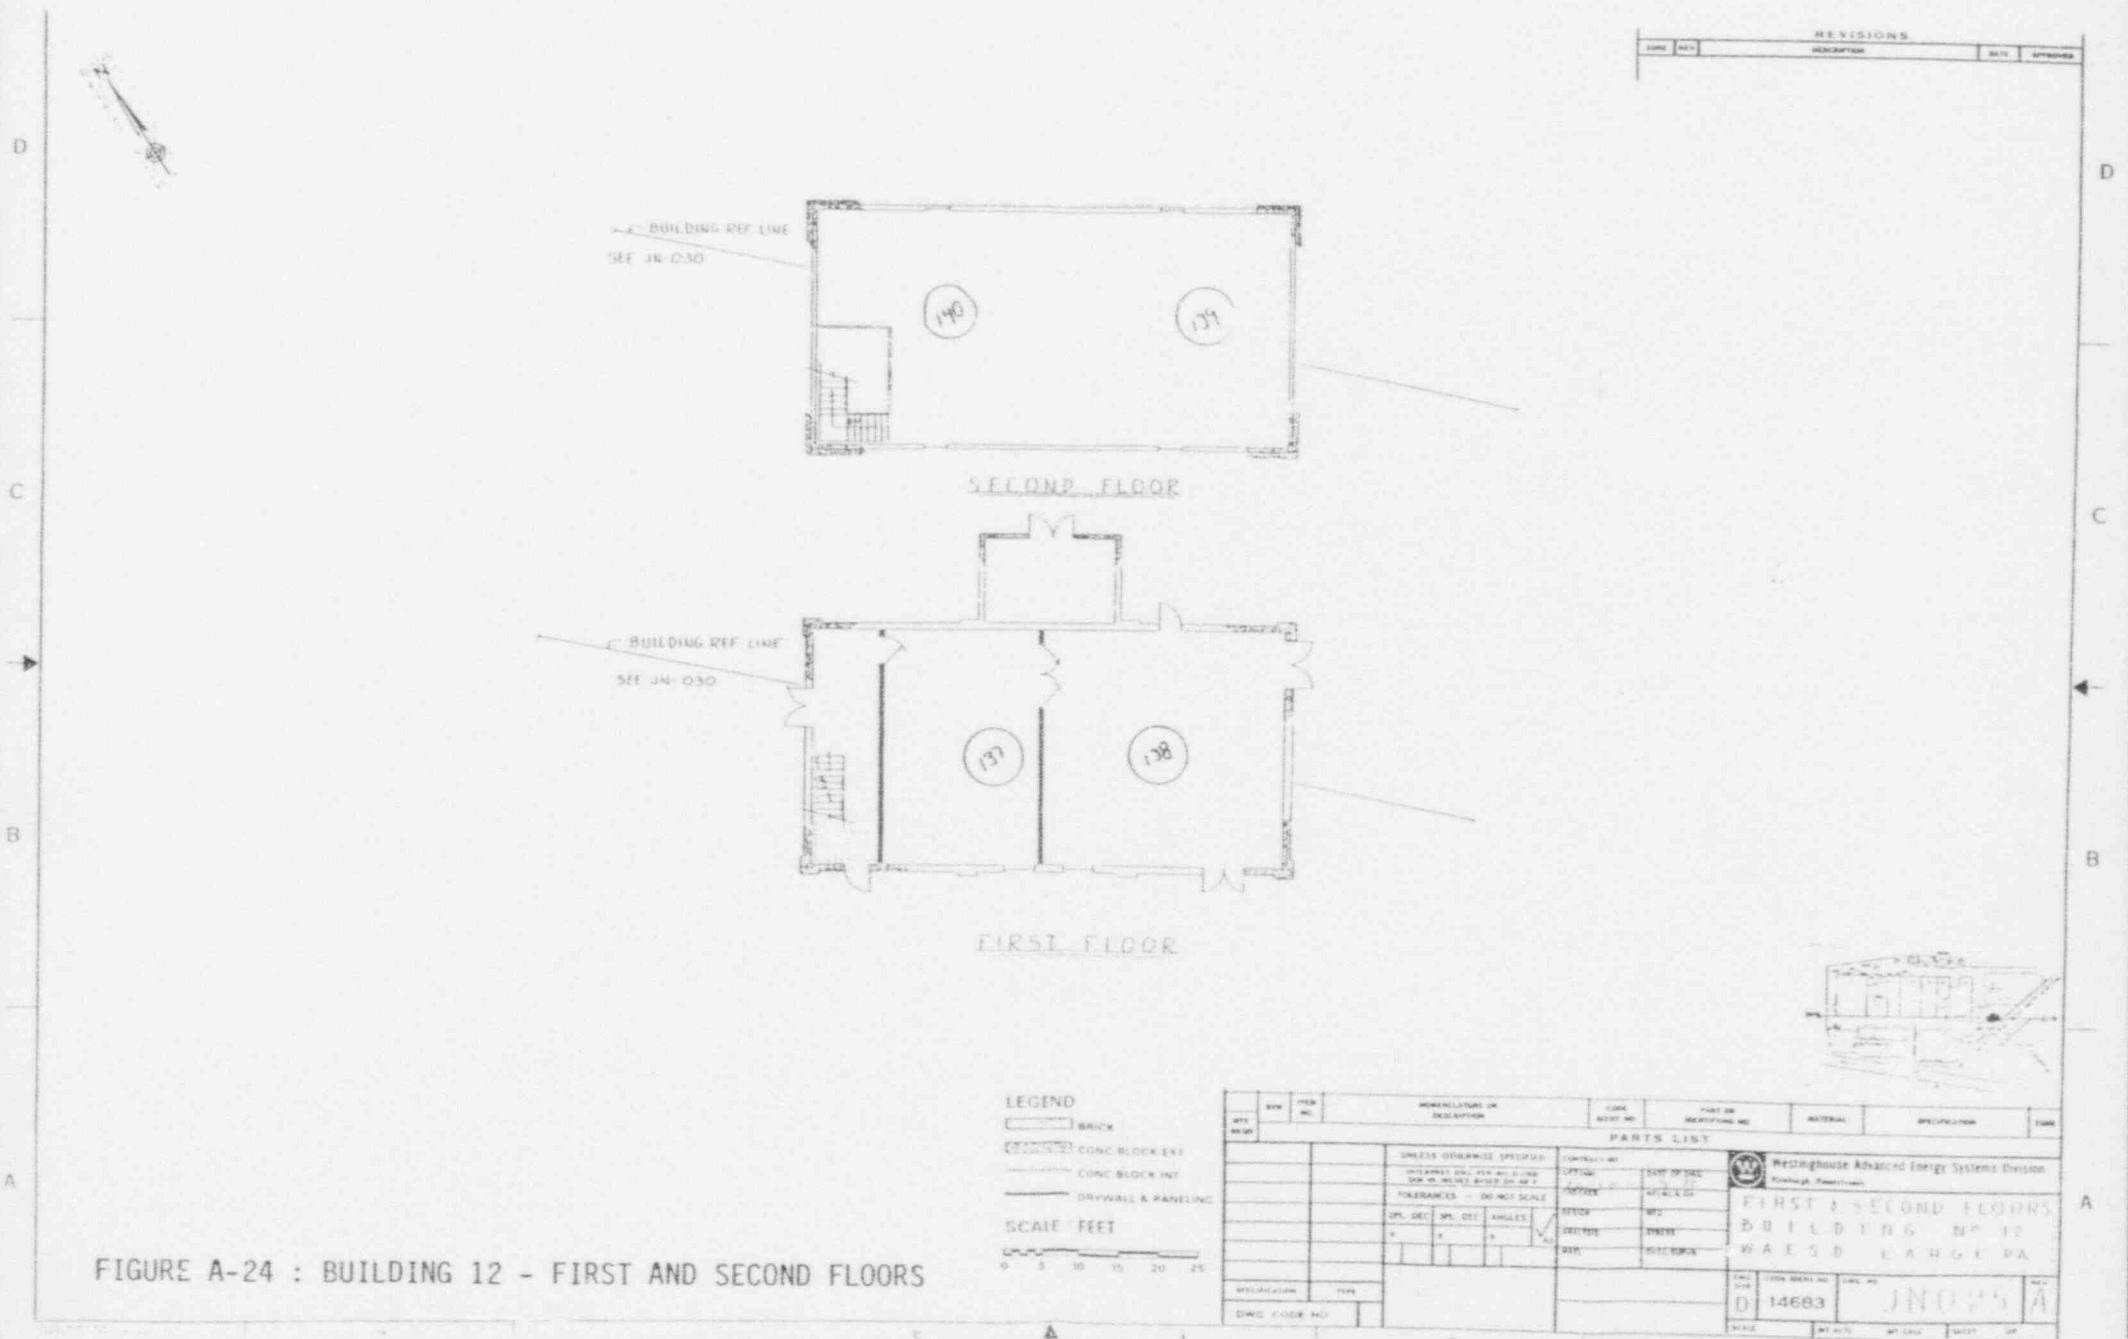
BUILDING 12 - FIRST AND SECOND FLOORS
